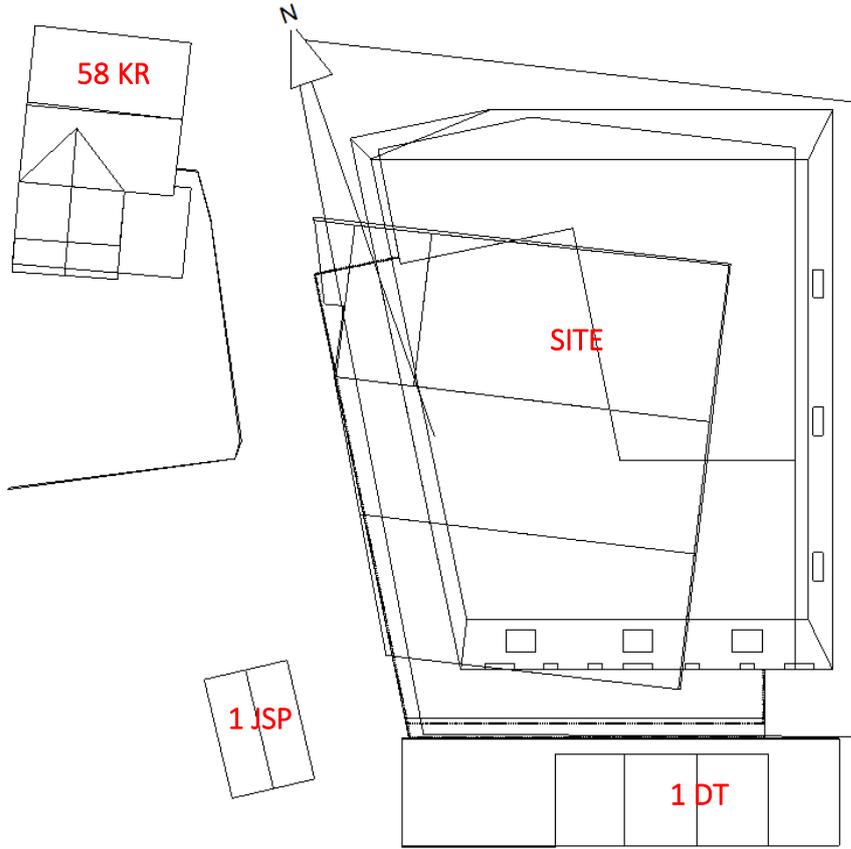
Site plan showing orientation of building model – note existing & proposed are overlaid
